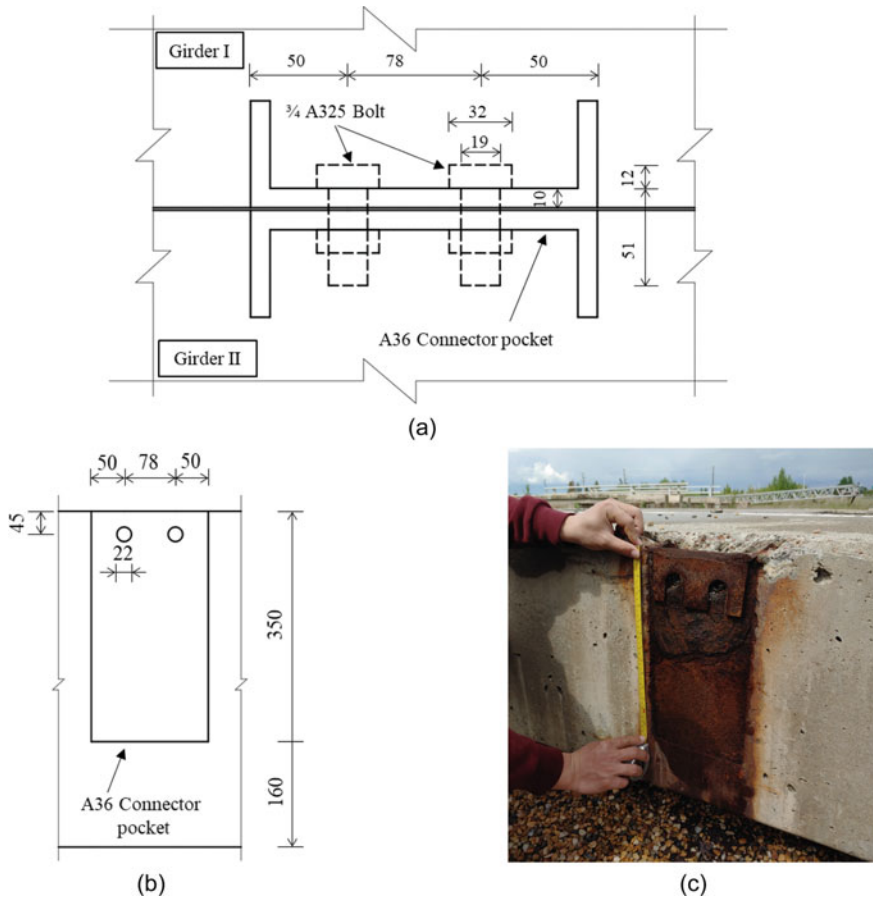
Shear connectors in: a Plan view, b Front view, and c Engineering practice (deteriorated) (dimension in mm)
